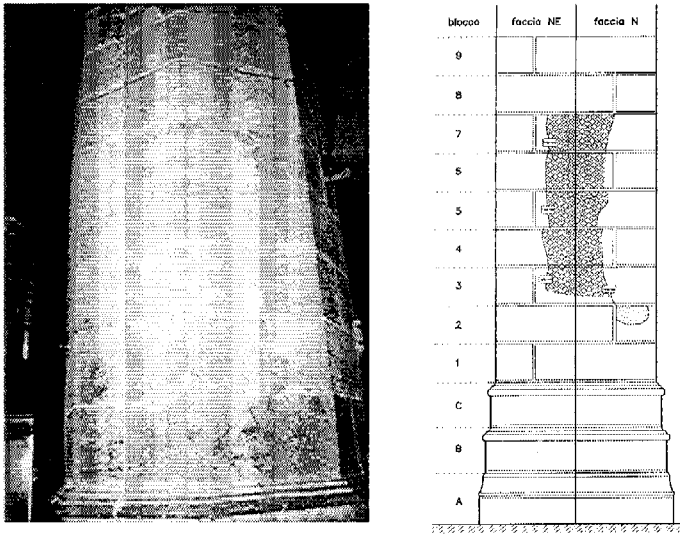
Cracks shaping a loose wedge along a vertical edge of a pier in Mallorca Cathedral
